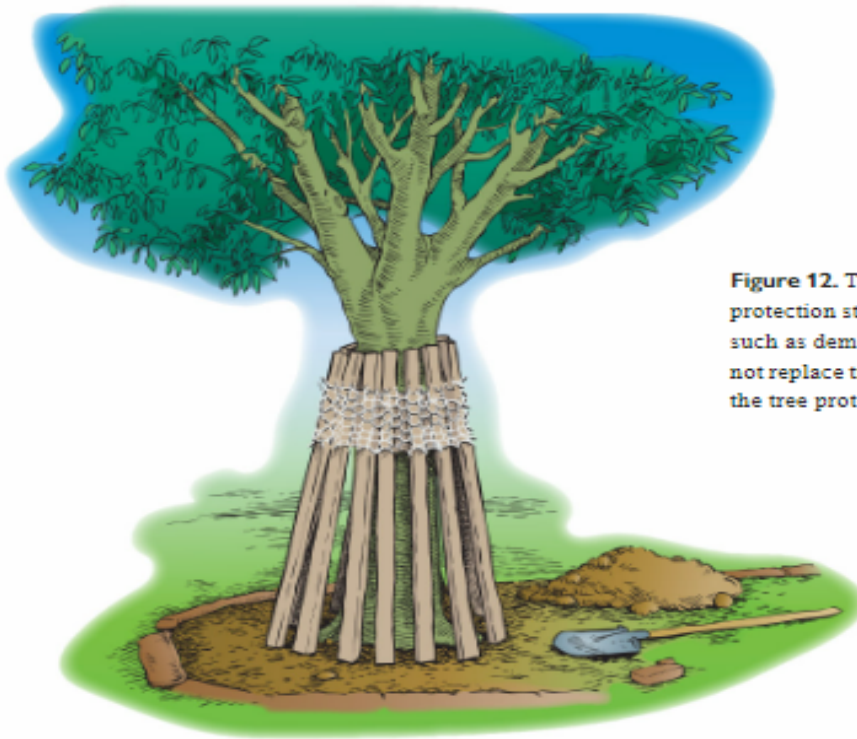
Temporary trunk and buttress root protection structure for short-term activities, such as demolition near the trunk. This does not replace tree protection fencing to enclose the tree protection zone.
